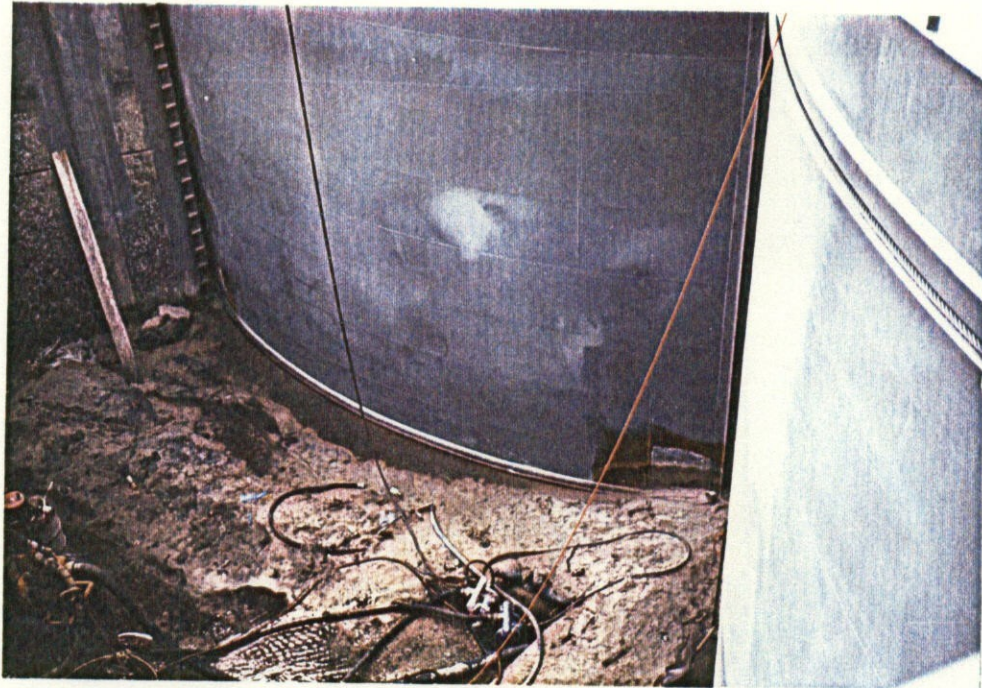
Skin plate of east gate after sand blasting. Notice surface corrosion in lower right hand corner. (18 March inspection)
